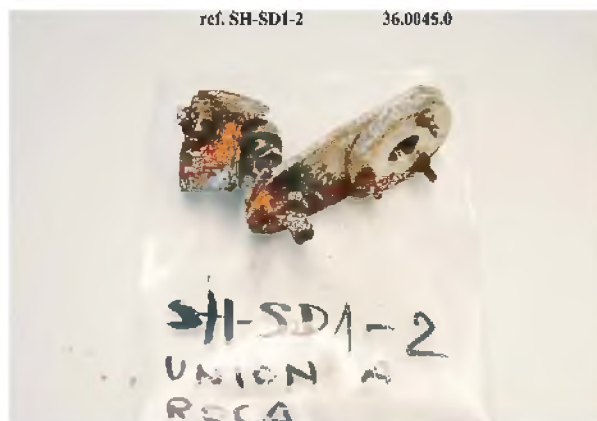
Detail of rock-sensor joint SH-SD1-02.
